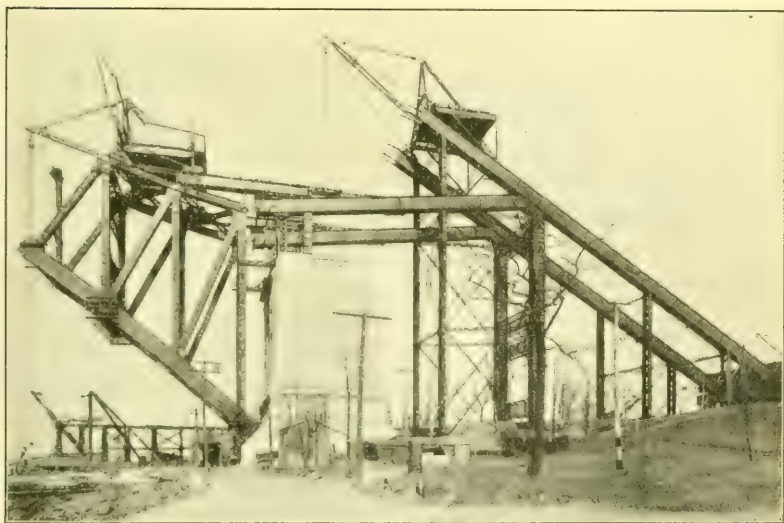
HELL GATE BRIDGE: ERECTION STAGE, APRIL 1ST, 1915, LONG ISLAND SIDE.
